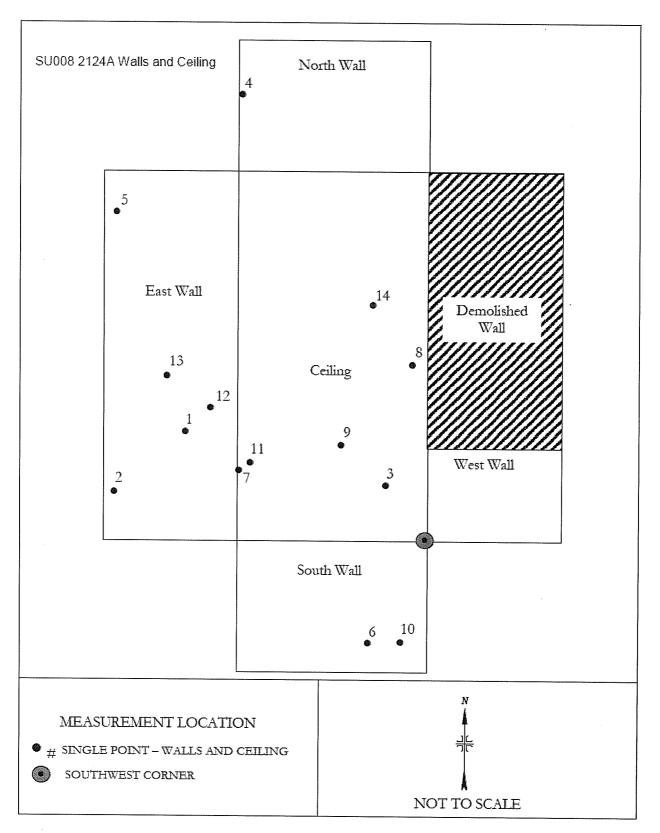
Survey Unit 008, Room 2124A Walls and Ceiling - Direct Measurement Locations
